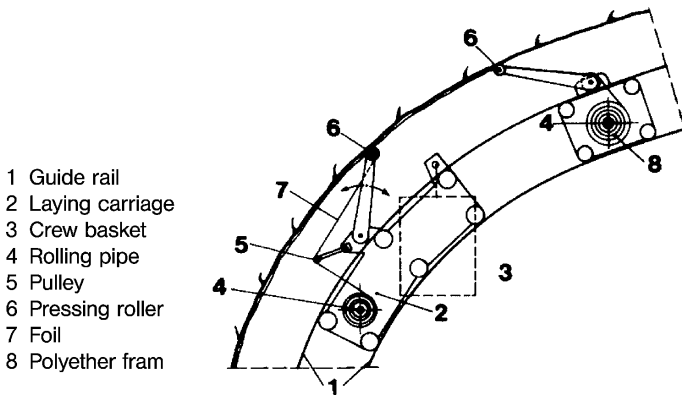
Laying machine for the waterproofing of the Seelisberg road tunnel.
